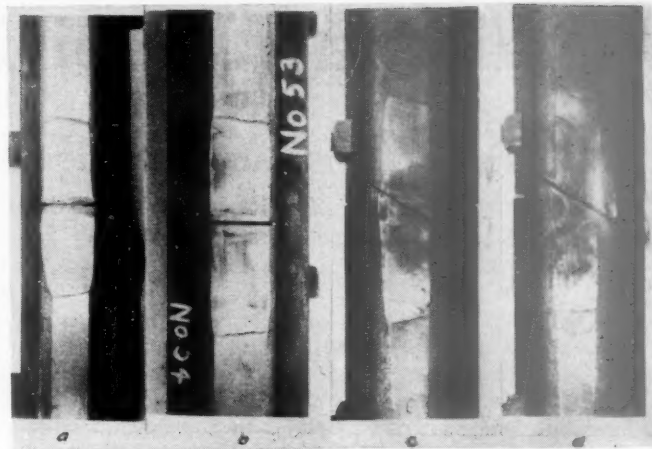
Rail Joints After Rolling Load Test for End Batter, All Joints With 1/8-in. Gap
